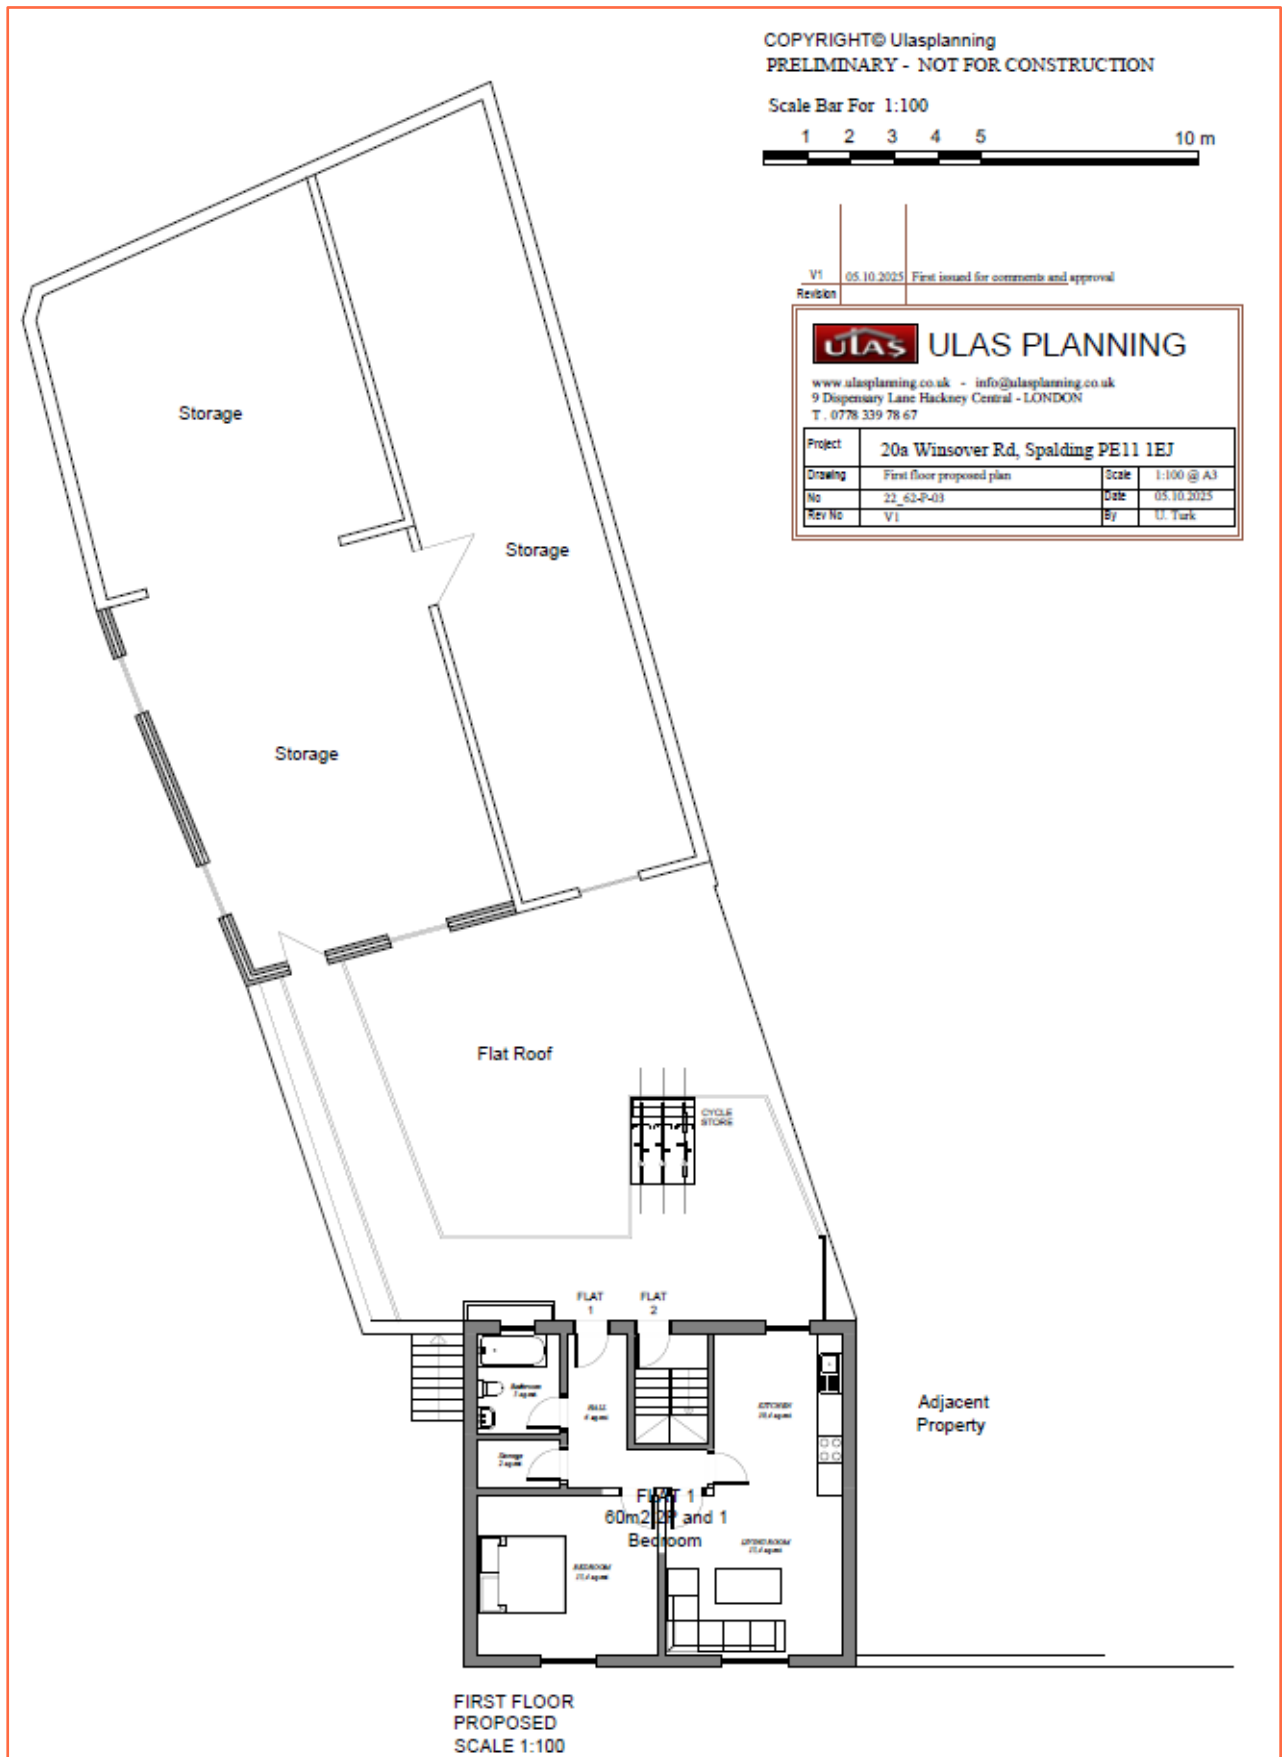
Proposed first floor plan (Source: ULAS Planning)
